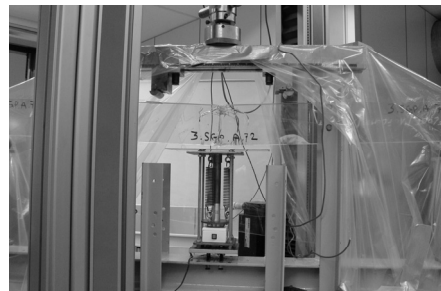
Typical final failure in 3.SG.A specimen (after resistance test on specimen with model level III damage).
